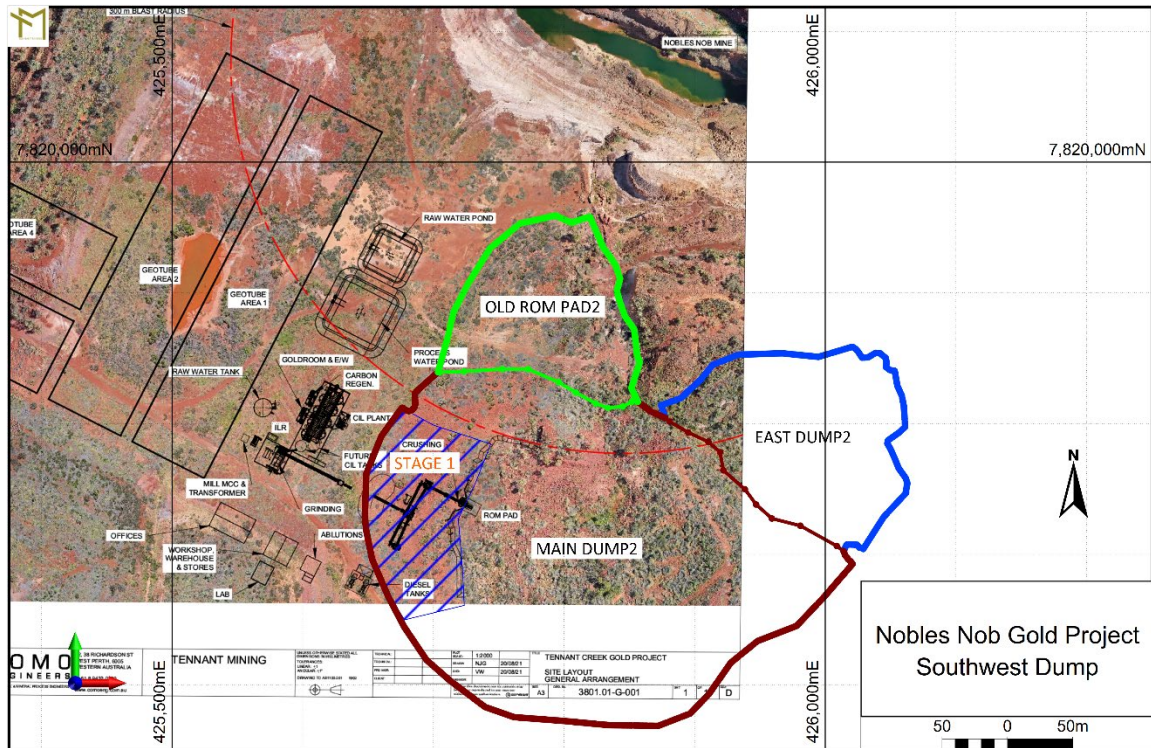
Plan view showing planned plant layout in relation to the SWD and Stage 1 of dump reclamation
